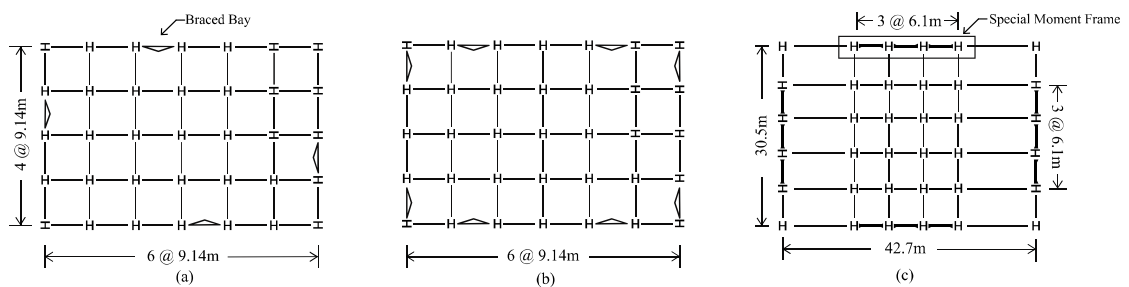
Plan views of the (a) 3- and 6-story SCBF buildings (b) 12-story SCBF buildings (c) SMF buildings
